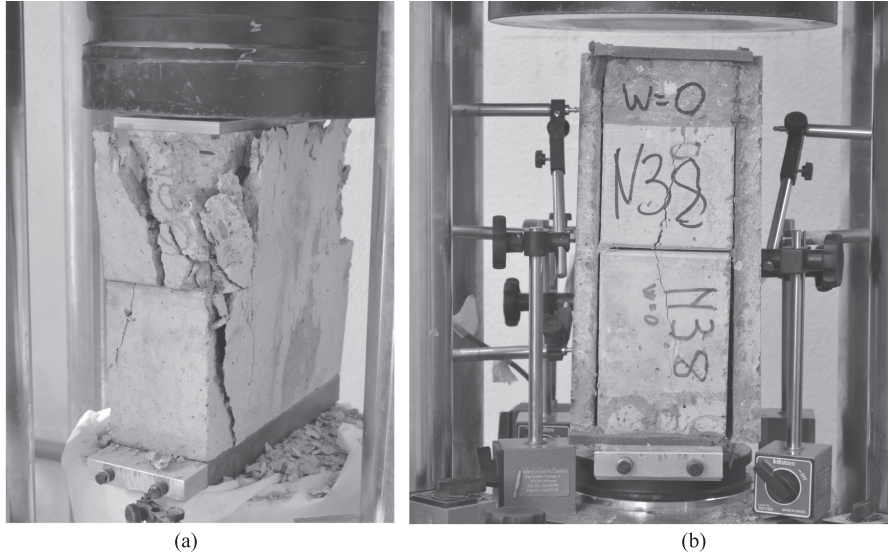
(a) Failure of concrete sample, (b) failure of sample reinforced with UHPFRC for  $w=0$  mm precrack level
